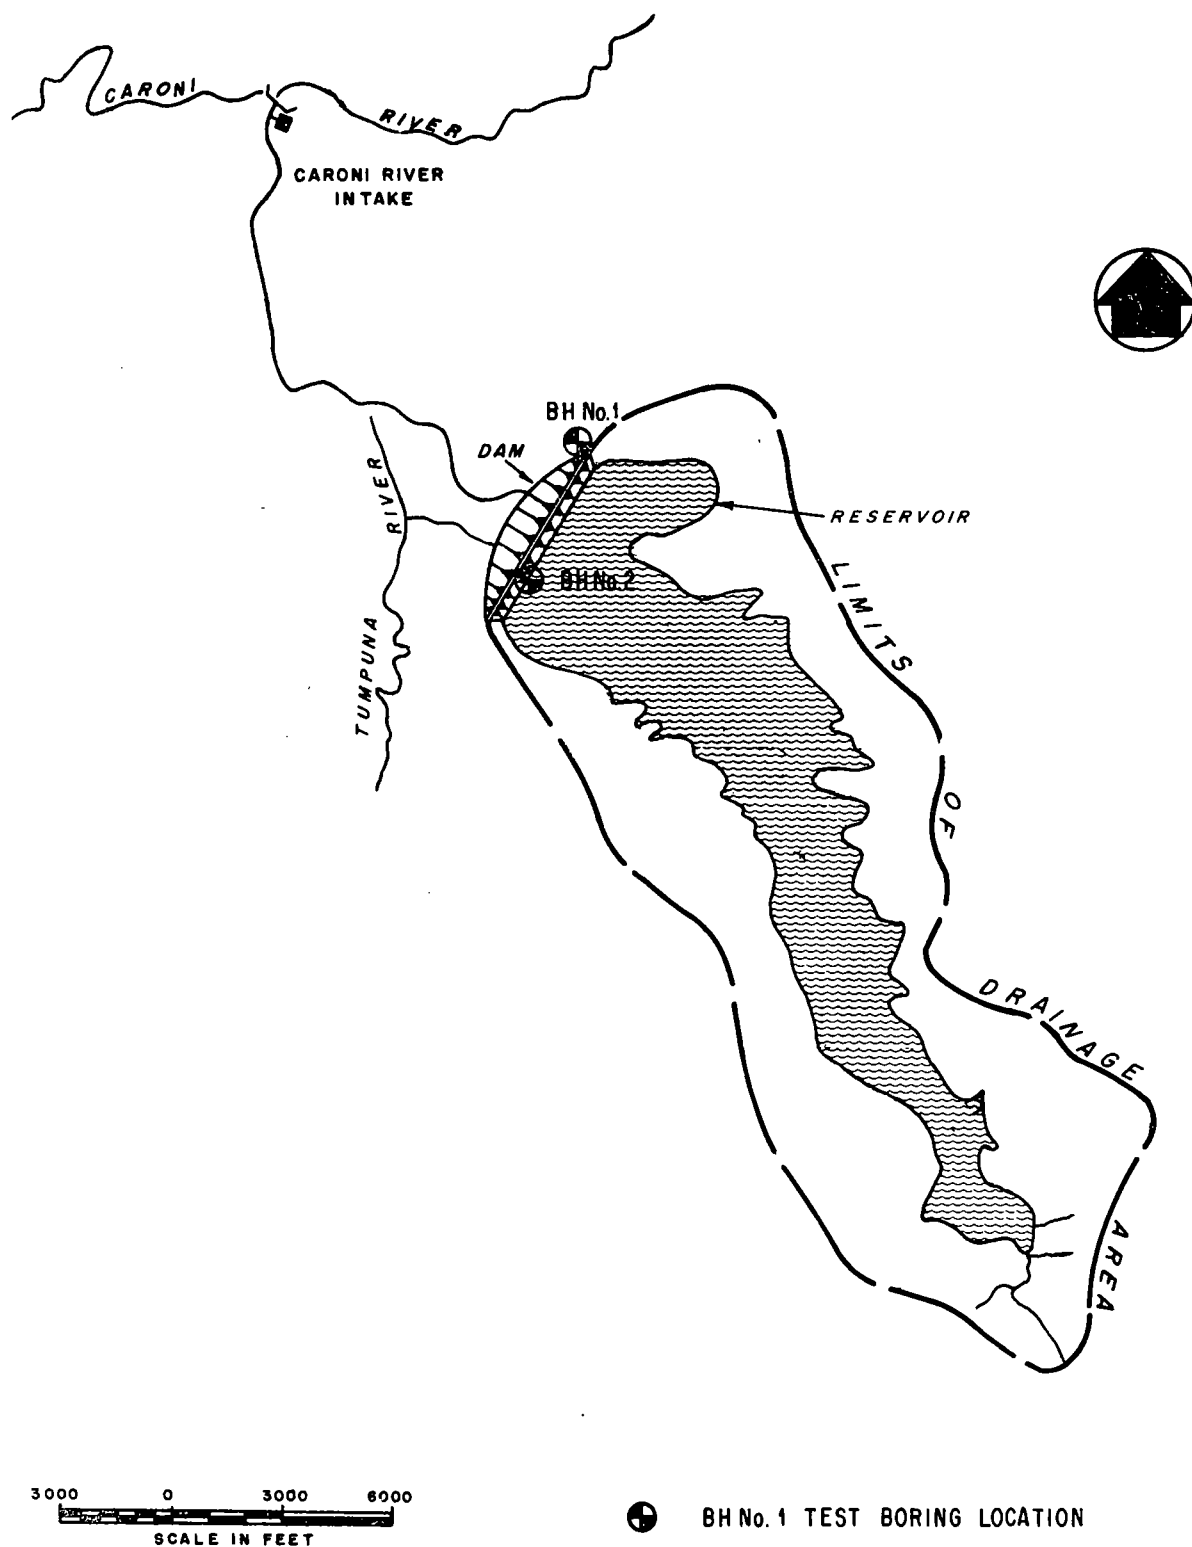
LOCATION PLAN – ARENA RESERVOIR
